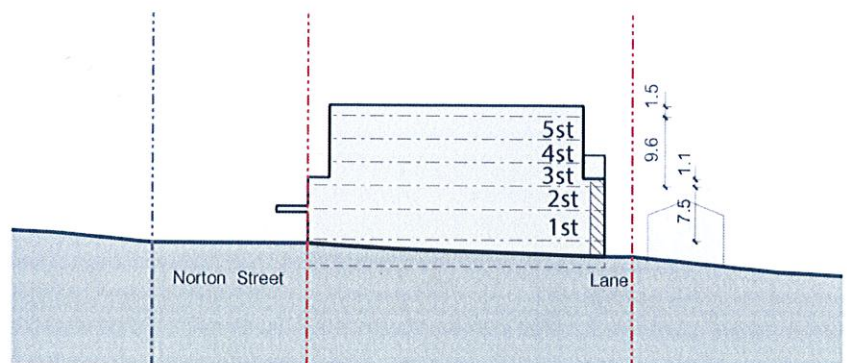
Carlisle Street _ Building envelope _ Section D-D
